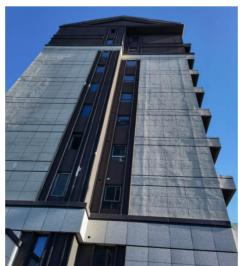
Expansion and cracking of vertical glue joints on the façade
